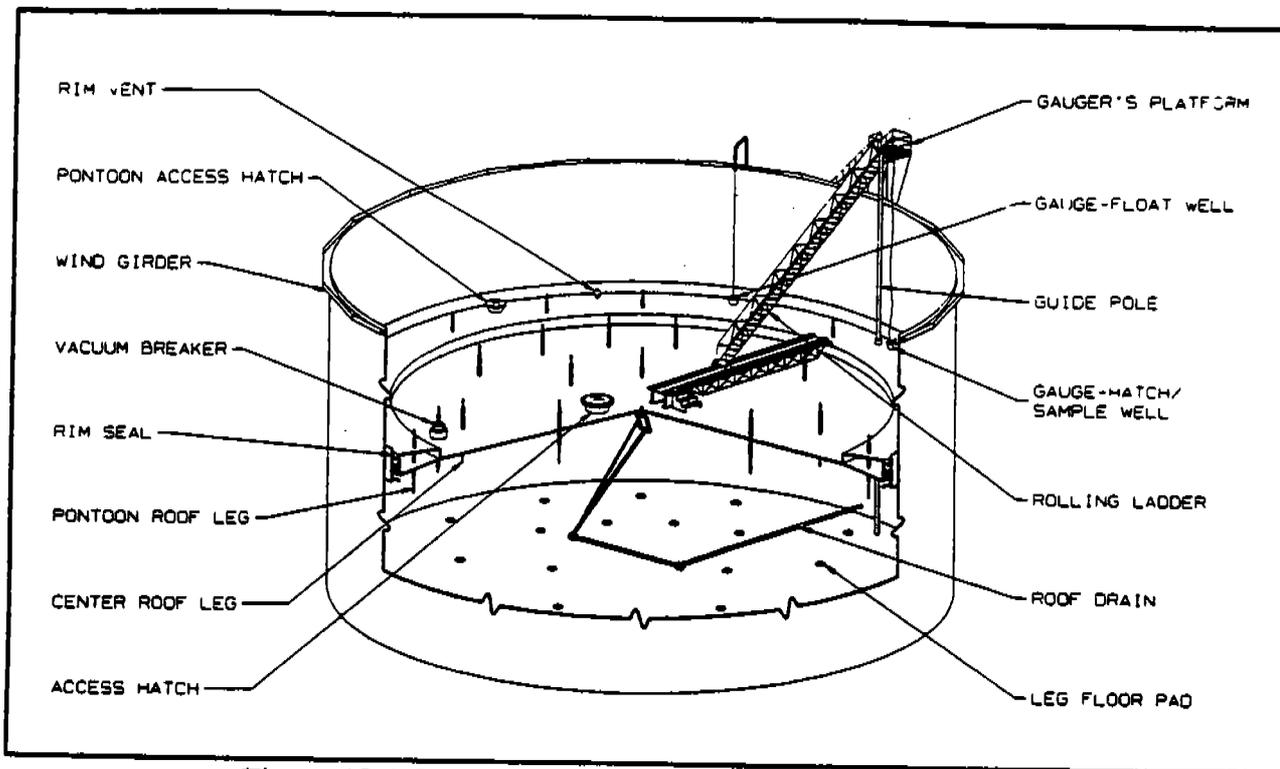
External floating roof tank (pontoon type).<sup>1</sup>
